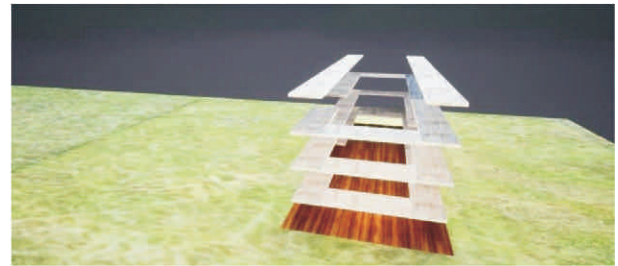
Slabs were created along with the base floor with rectangle shape; Wooden textures added to the floor to bring out the floor finish
